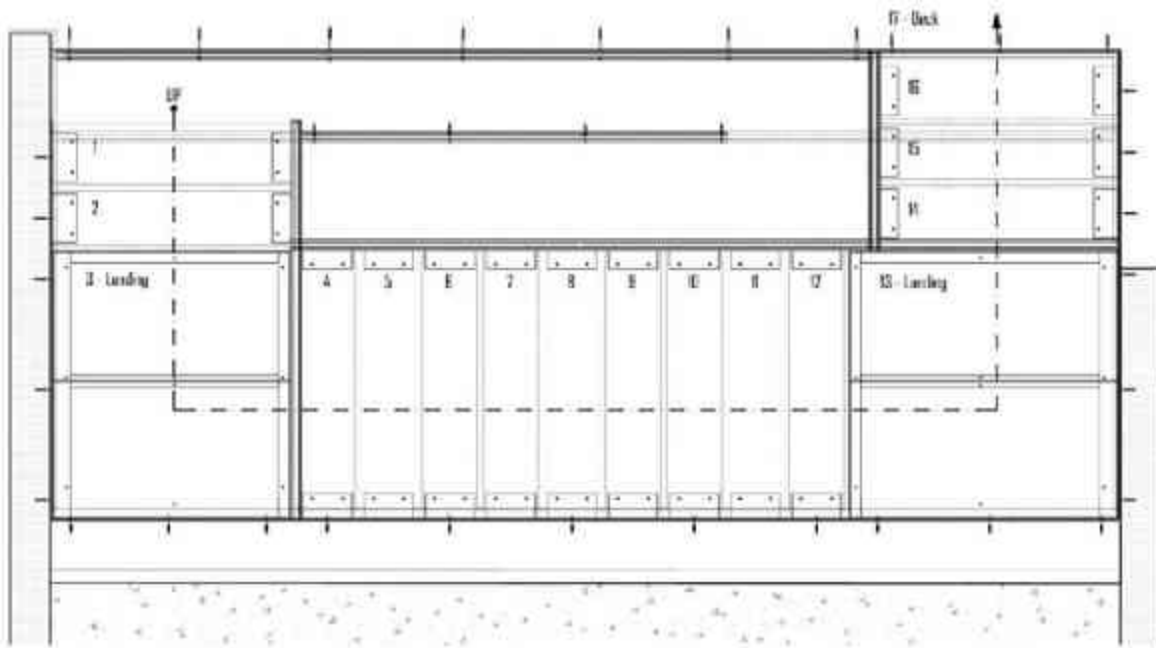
"U" Stair at Second Floor with two landings / 1919 Mariposa Street
